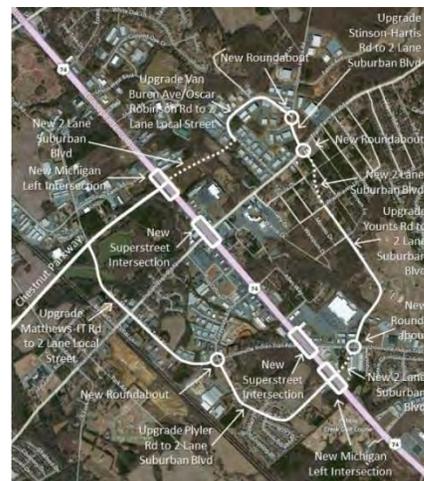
Future district revitalization area bounded by Chestnut Parkway, Stinson Hartis Road, Younts Road and Matthews-Indian Trail Road
